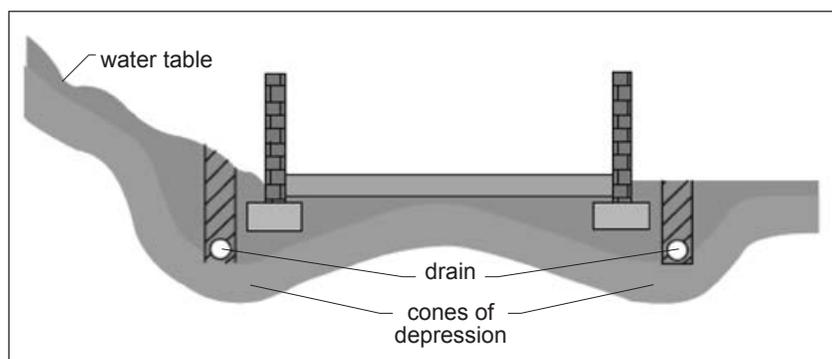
Example of improved drainage to create a ‘cone of depression’ to prevent groundwater emergence. Improved drainage allows groundwater to drain by gravity away from the building, lowering groundwater levels locally.
